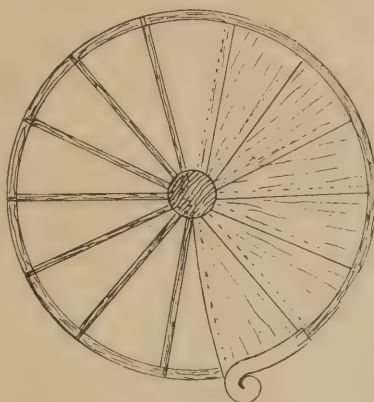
PLAN OF CIRCULAR NEWEL STAIRS.
